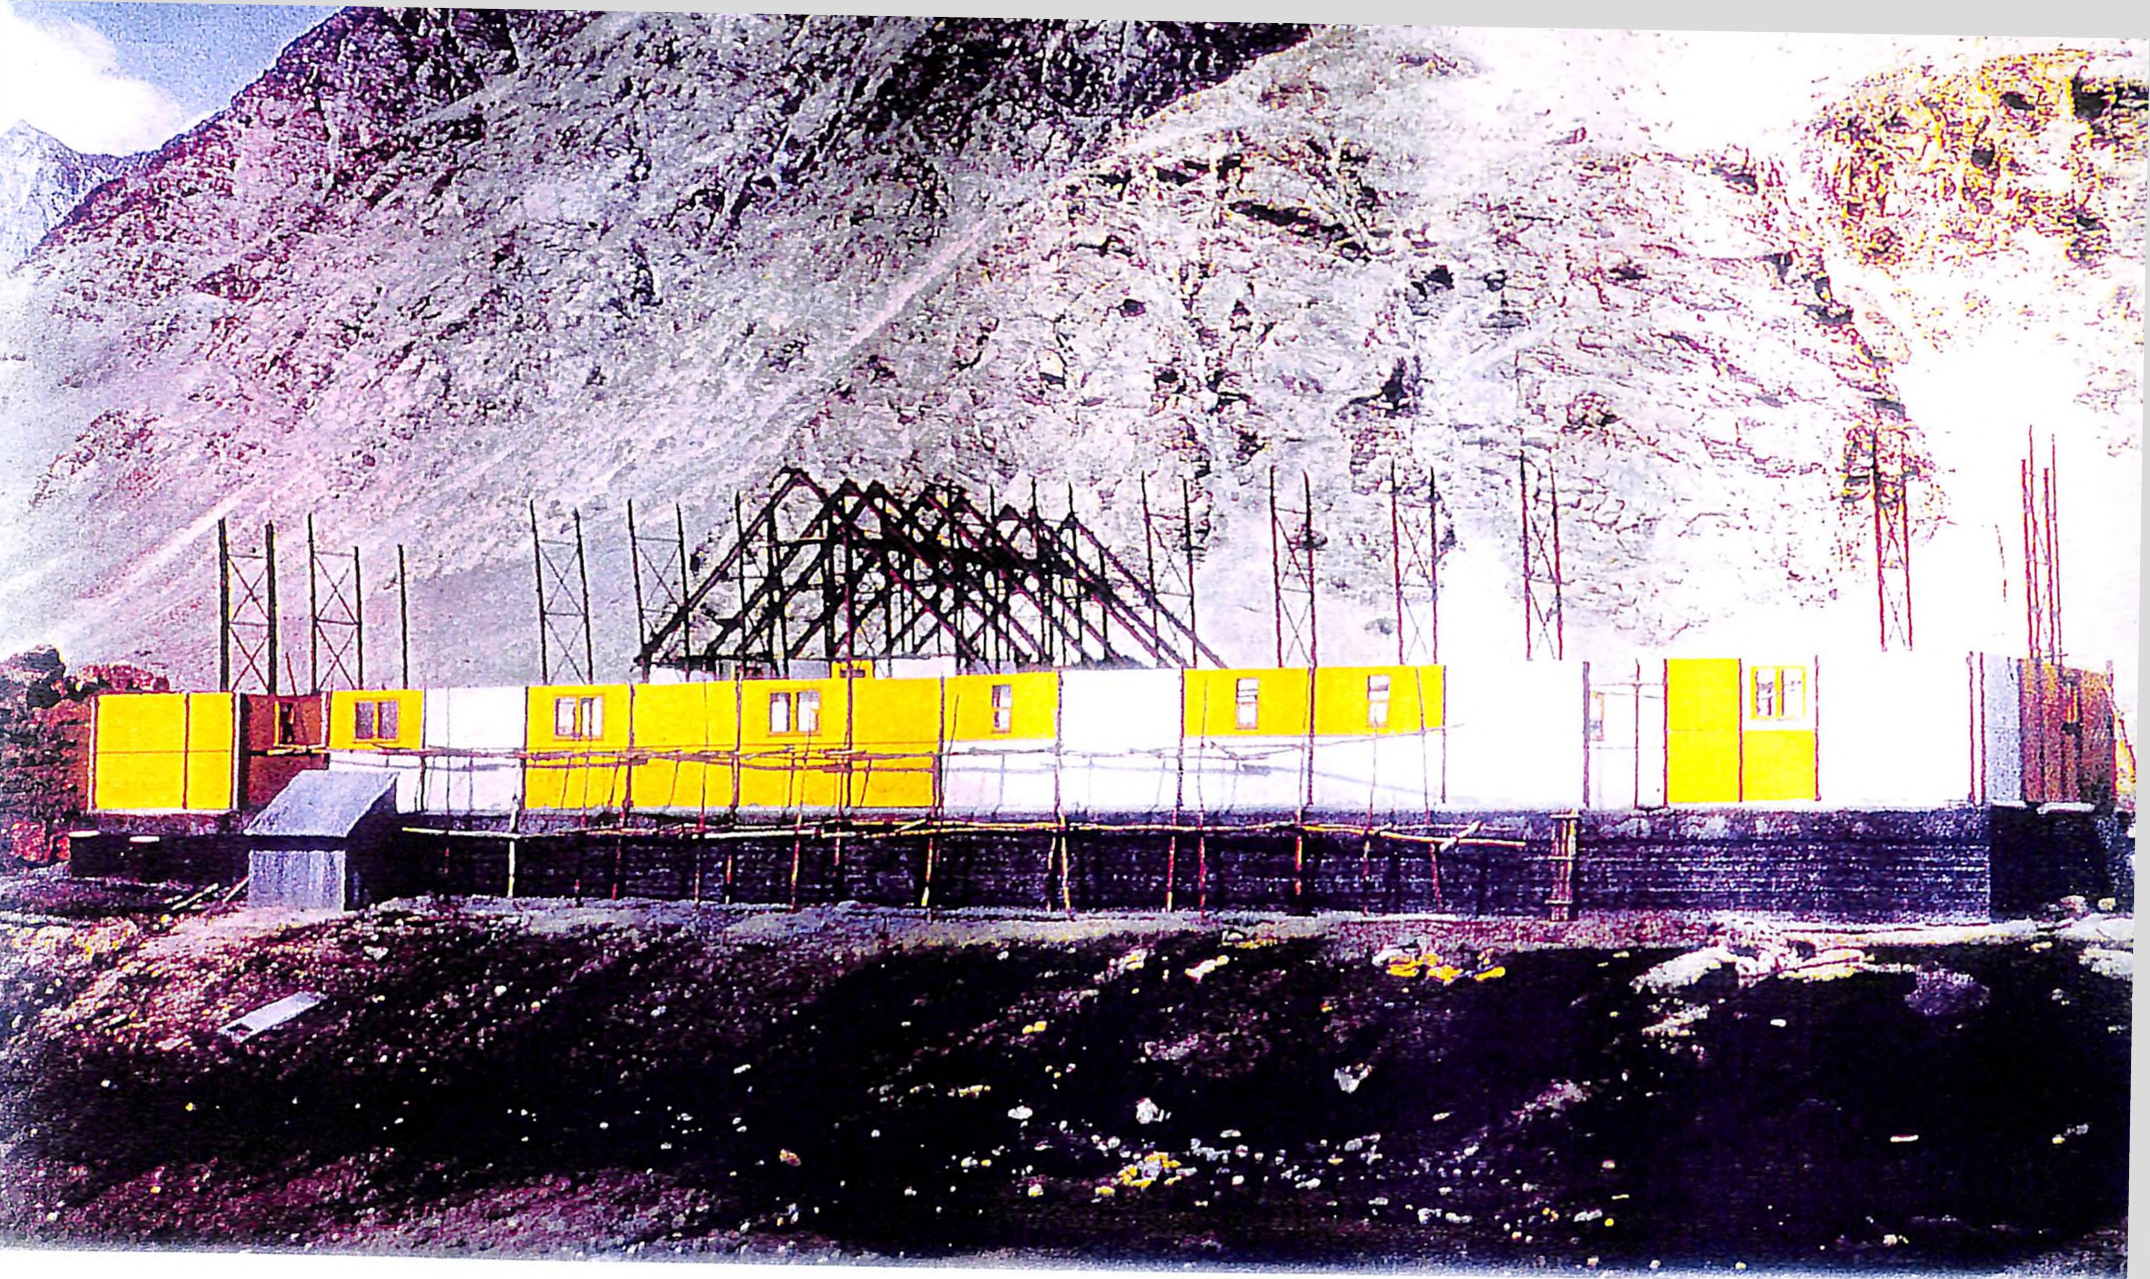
ASSEMBLY OF STRUCTURE AND SANDWICH PANELS
